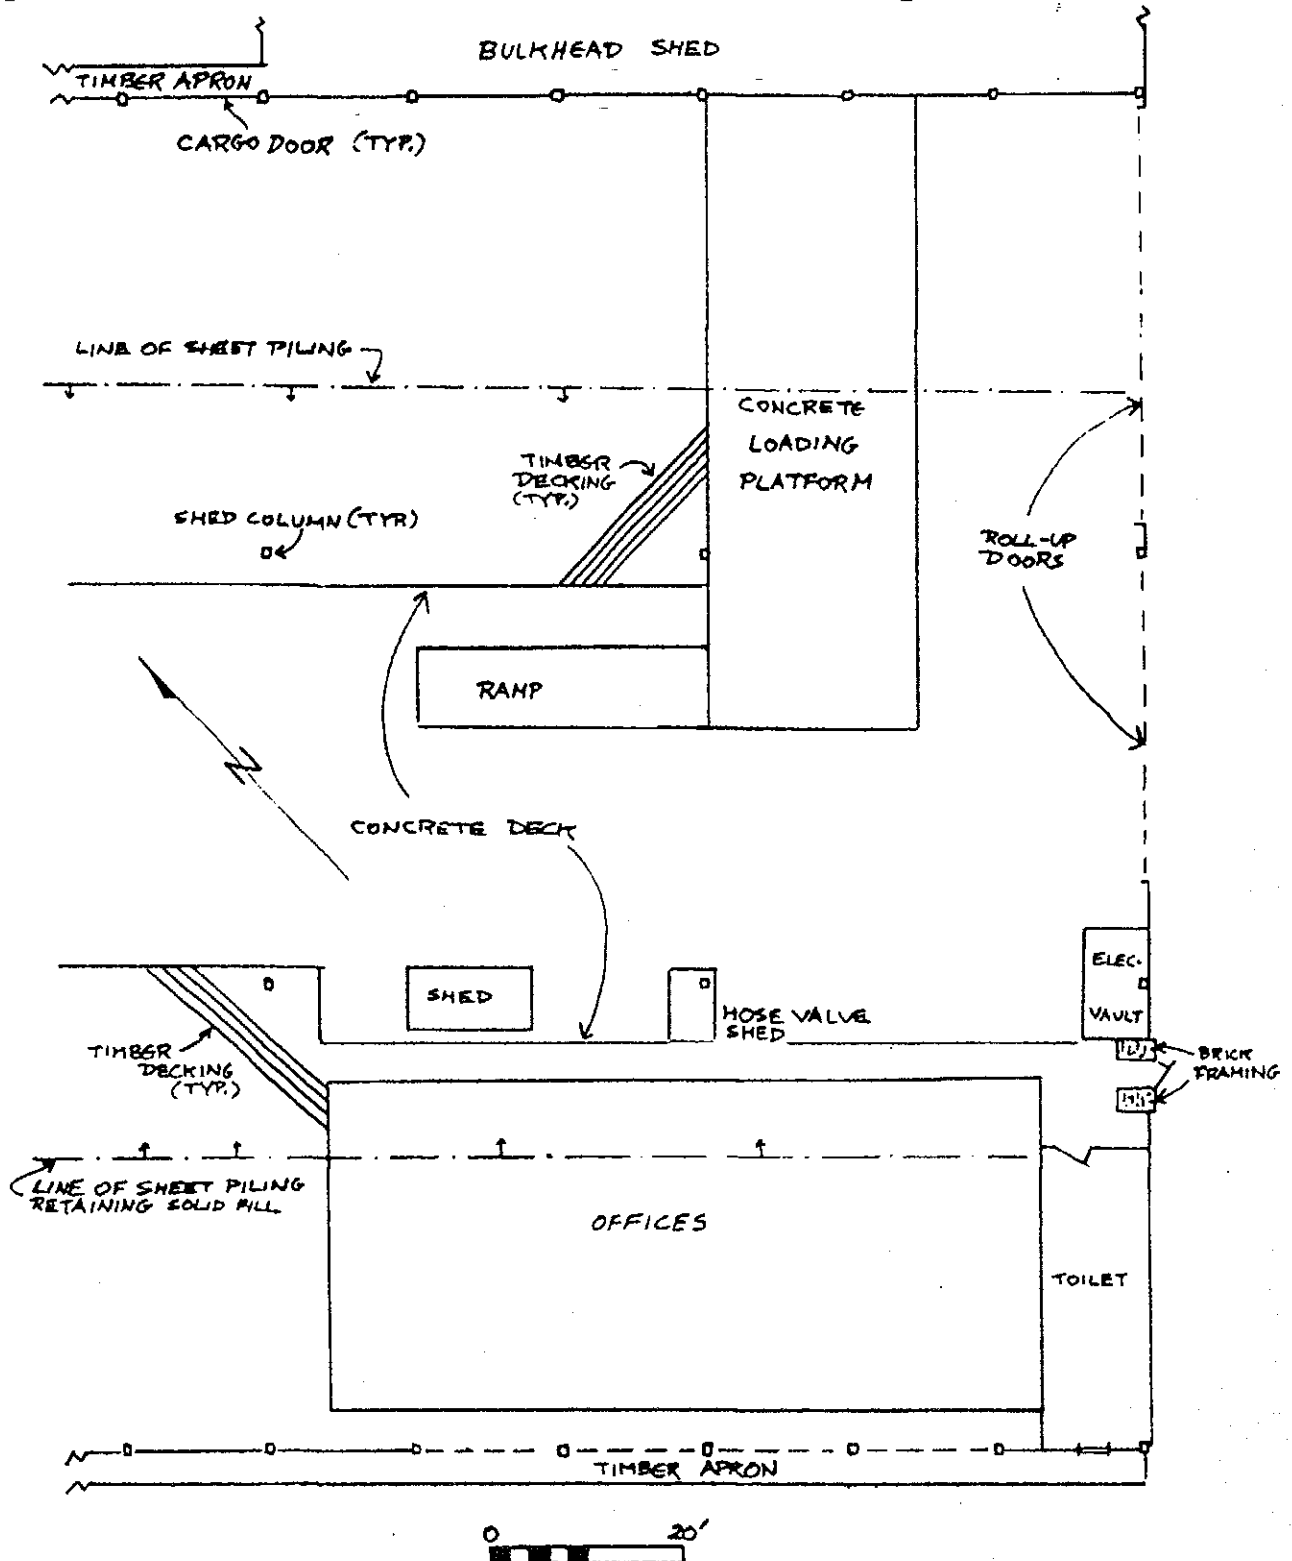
PLAN OF INSHORE END OF PIER 5, 1988.
